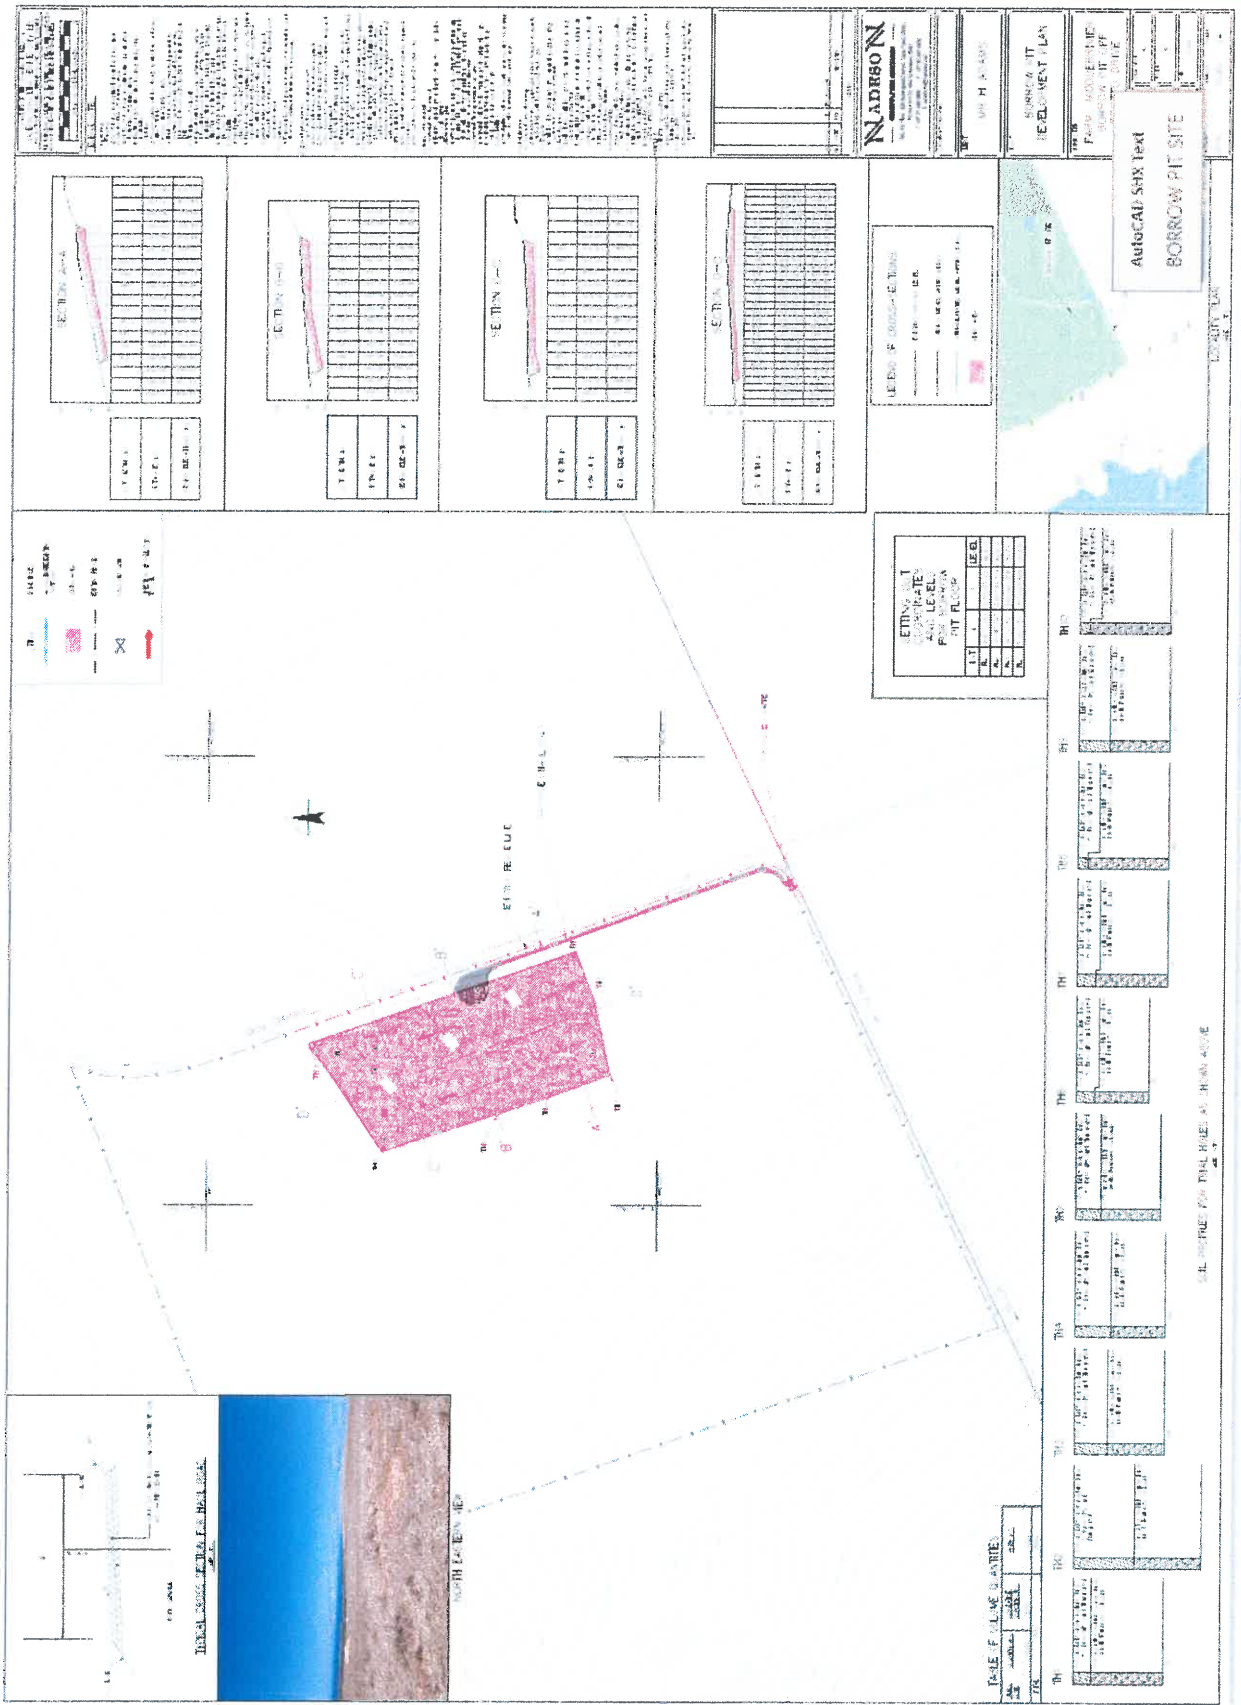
Plan of proposed borrow pit and haul road showing profiles with expected excavation depths.
